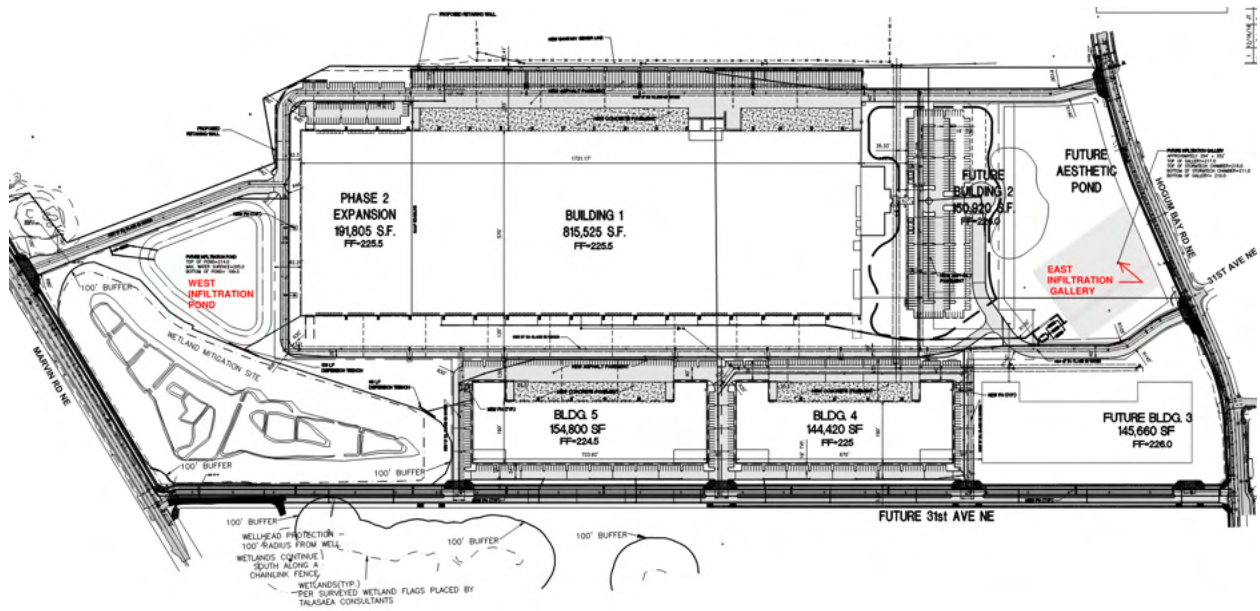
Site Plan showing infiltration facilities. Reproduced from Barghausen (2017).
